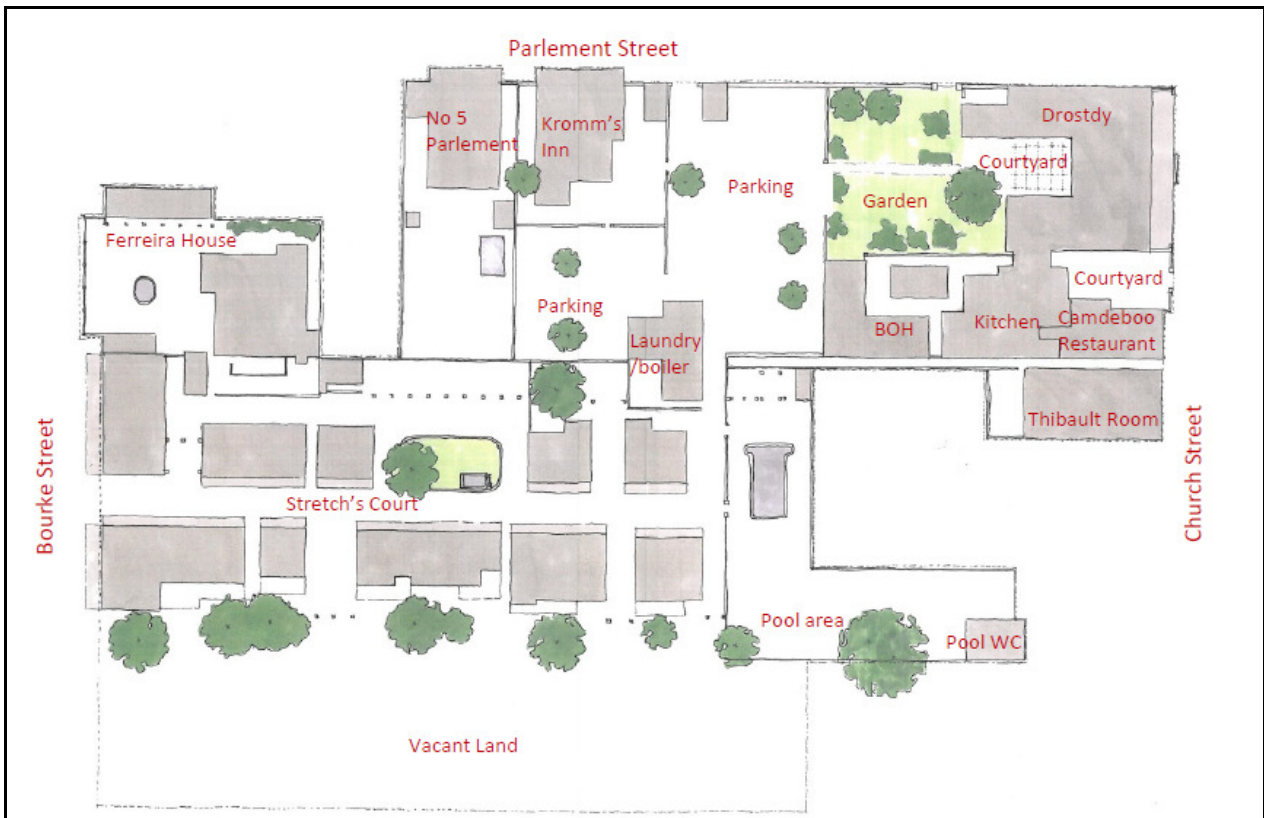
Existing site layout (Urban Concepts 2013) indicating location of buildings discussed in the text.
